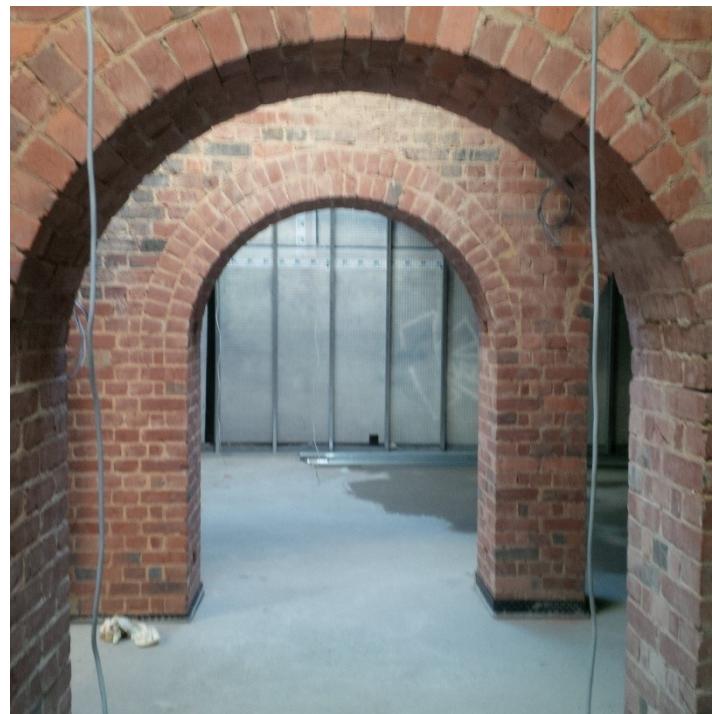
The cleaned arch in the north room seen from the south room (looking north cross the corridor).
